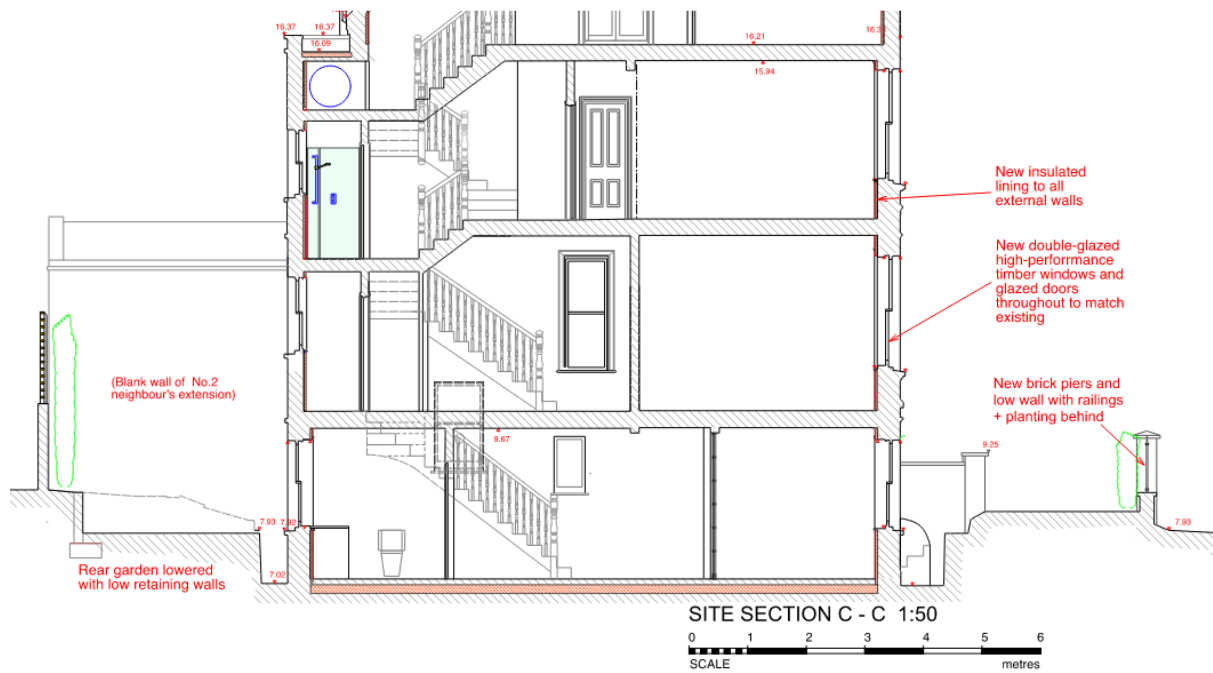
(above): Proposed section showing relationship between lower ground floor flat and front/rear gardens (source: application drawings)
